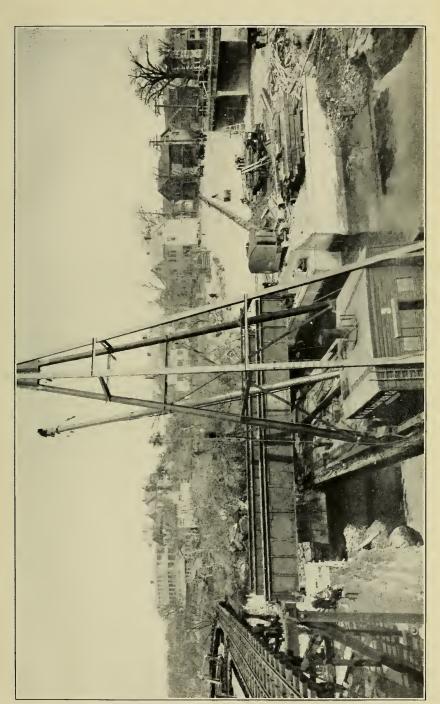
PLATE II.—PLACING HEAVY GIRDERS IN POSITION, NEPONSET RIVER BRIDGE, MILTON.
